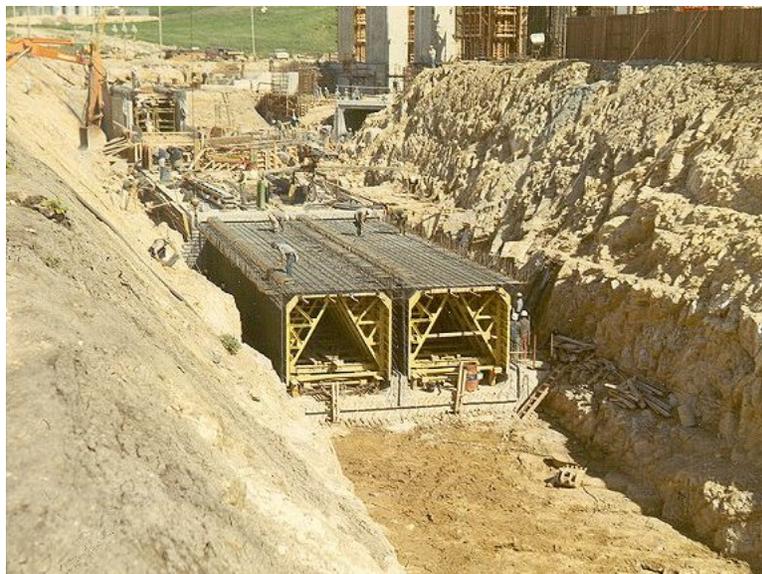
Original Circulating Water Tunnel Excavation & Construction
